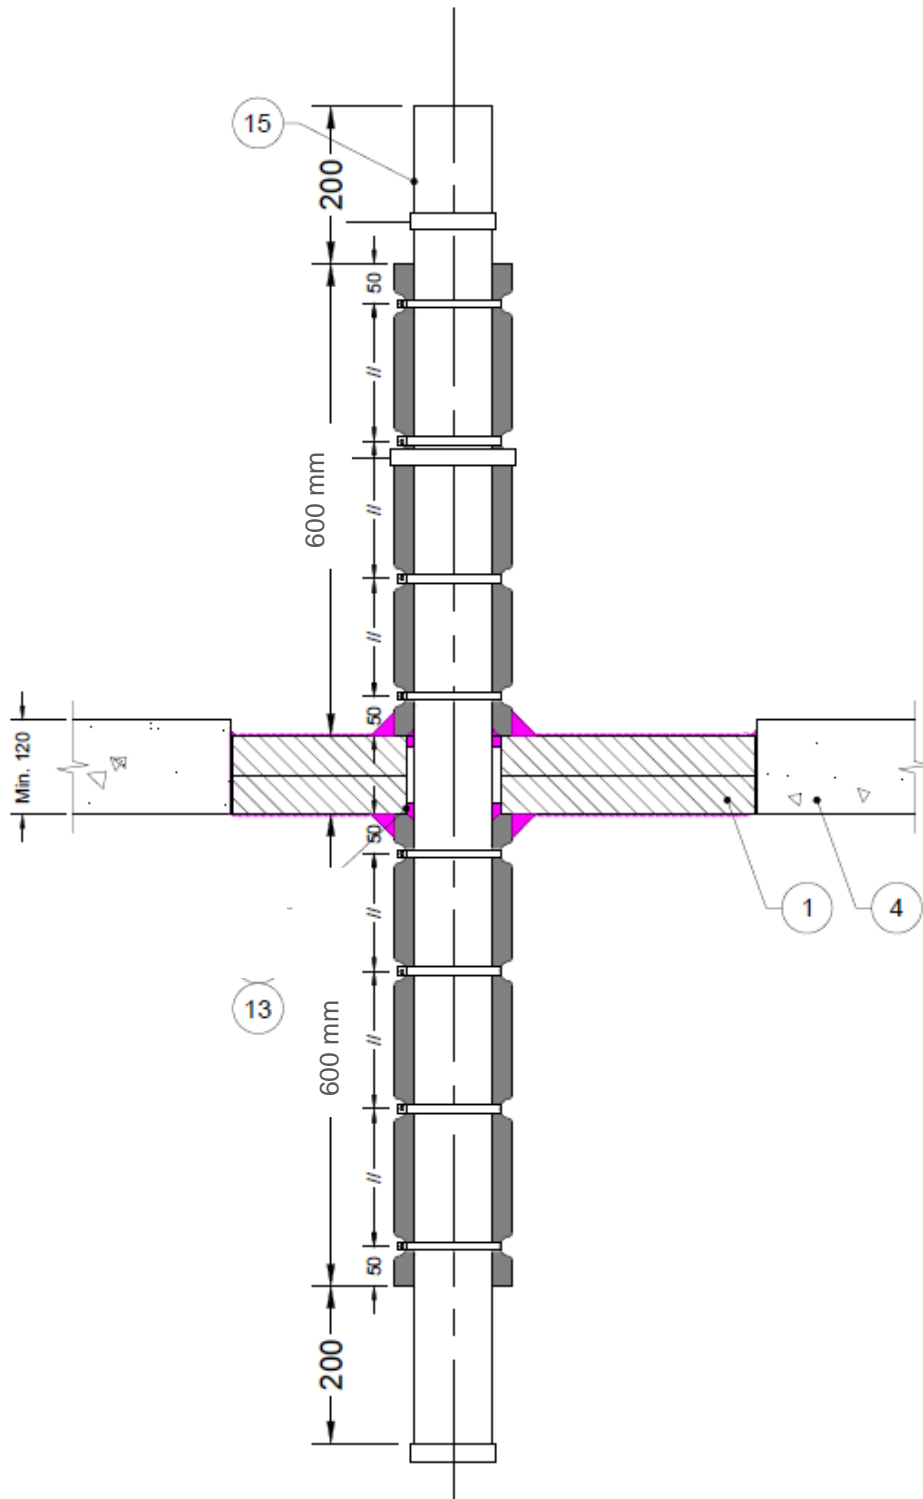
PROMASEAL® Bulkhead Batt in floors (Section C-C)
